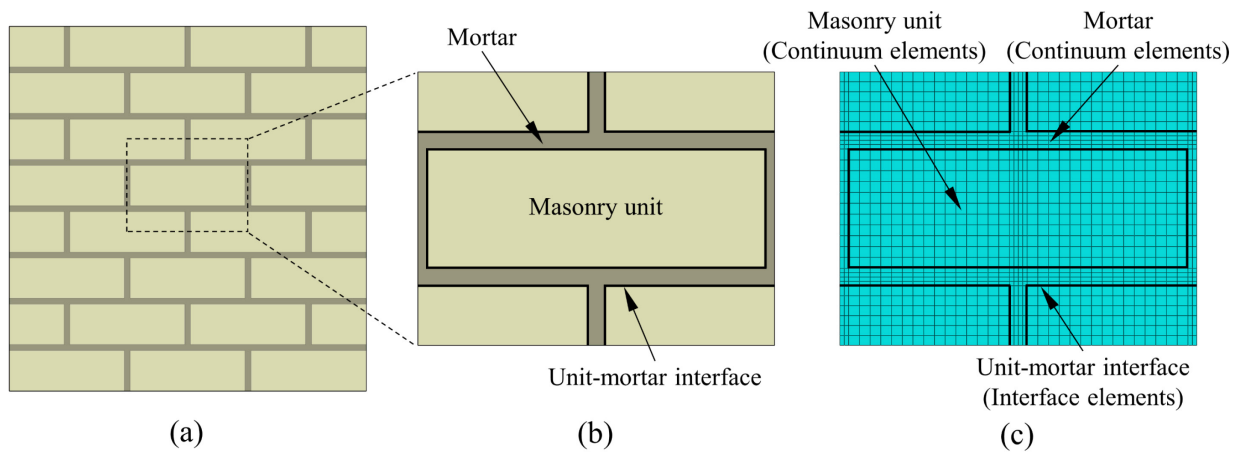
DMM of an URM wall: (a) masonry wall, (b) RVE, and (c) FE discretization.
